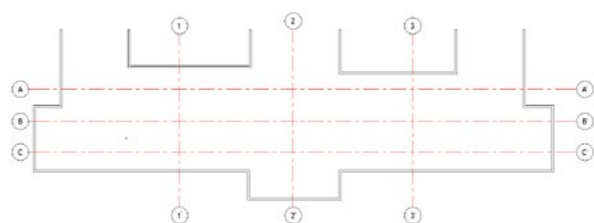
| Scheme of the constructed sections (A, B and C: longitudinal sections; 1, 2 and 3: transverse sections)
